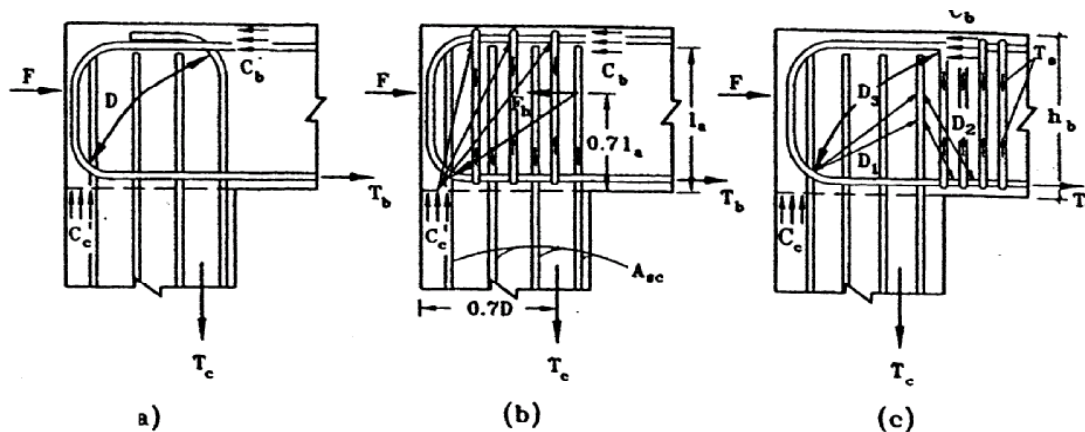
Knee Joint Reinforcement Under Opening Moments (Adapted from Priestley et al., 1996)
